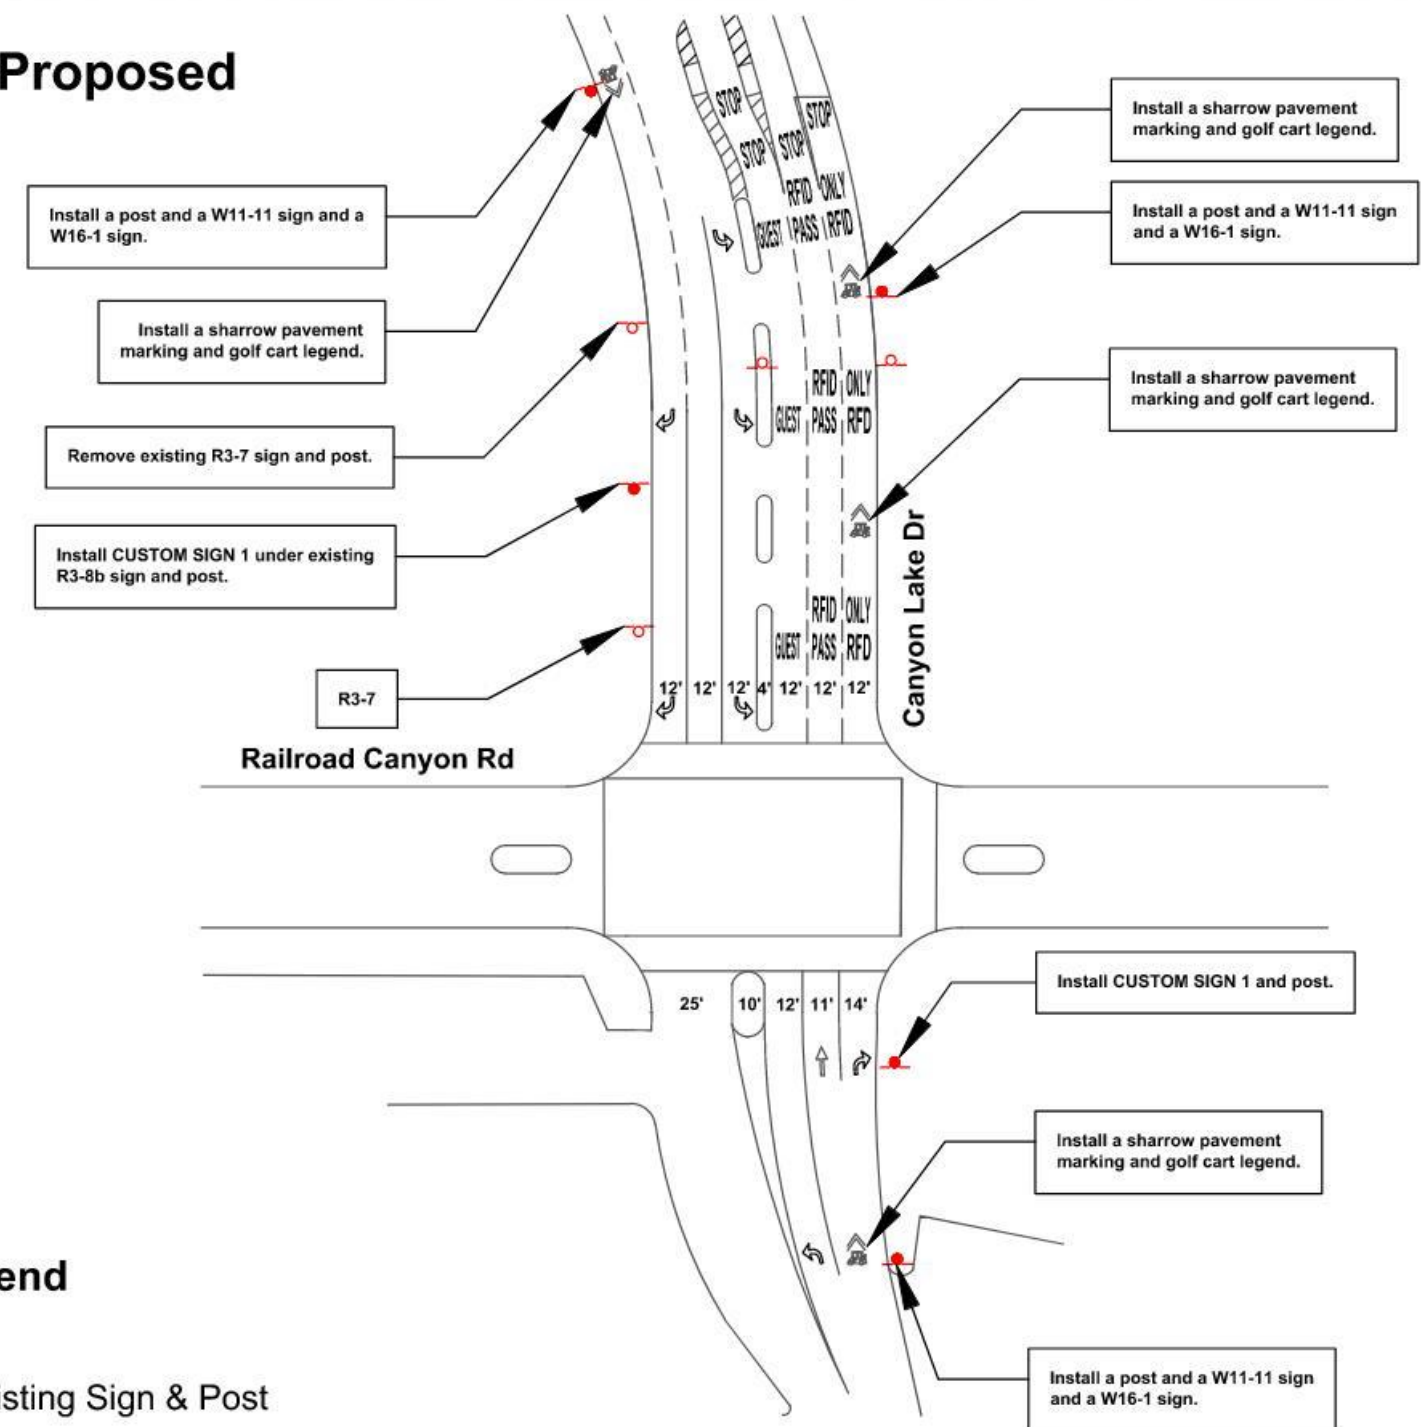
View of the South approach leg (Northbound) of the Canyon Lake Drive South/Towne Center at Railroad Canyon Road intersection.
